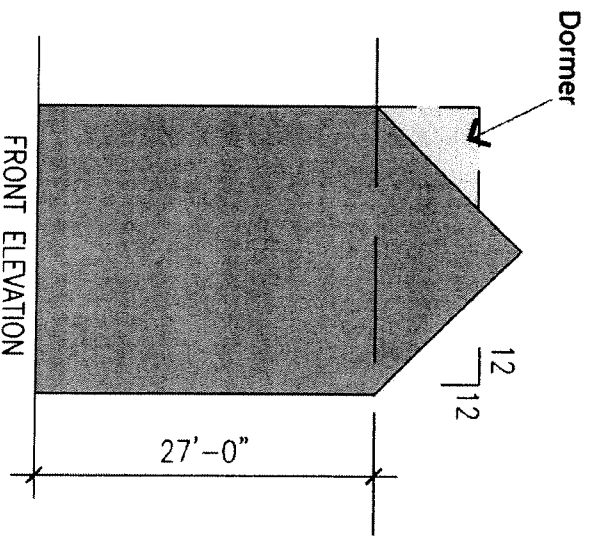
Permissible building envelope. Dormers comprising less than 10% of the footprint area may project above the height envelope.
